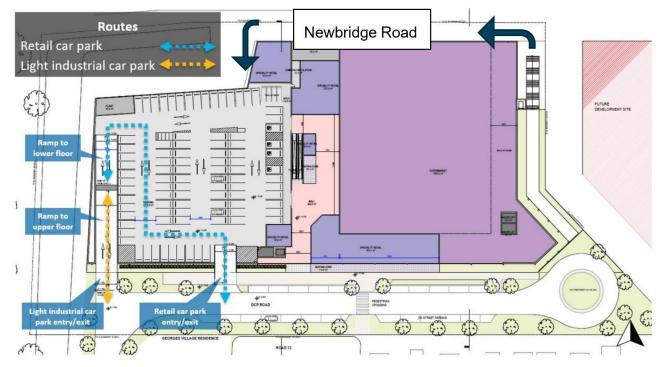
Internal circulation arrangements and indicative Newbridge Road access points (EMM Consulting 2023).
